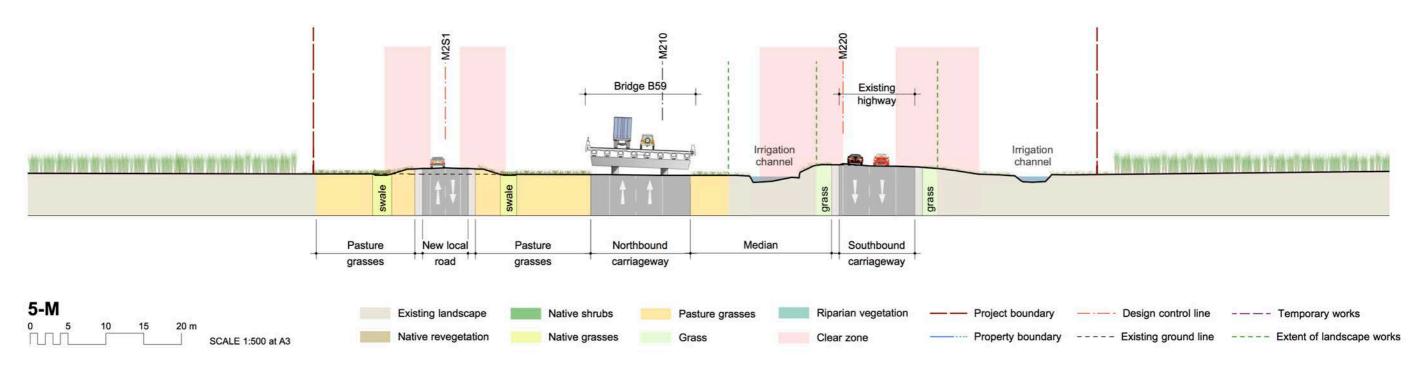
Section 5-M at Bridge B59 – Northbound Bridge for Clarence Floodplain Opening 11
